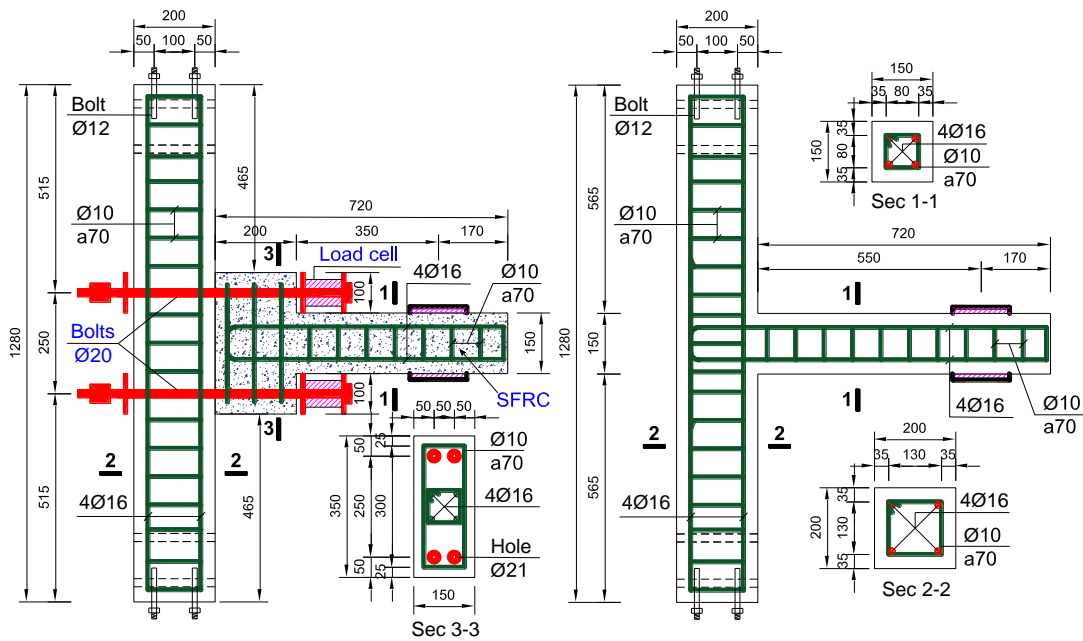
Designs of the precast specimen (left) and monolithic specimen (right) (unit: mm).
